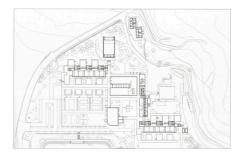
Design plan of the groundfloor school distribution. Source: Plans: Batllé i Roig Arguitectes. (redraw plan 2004).
